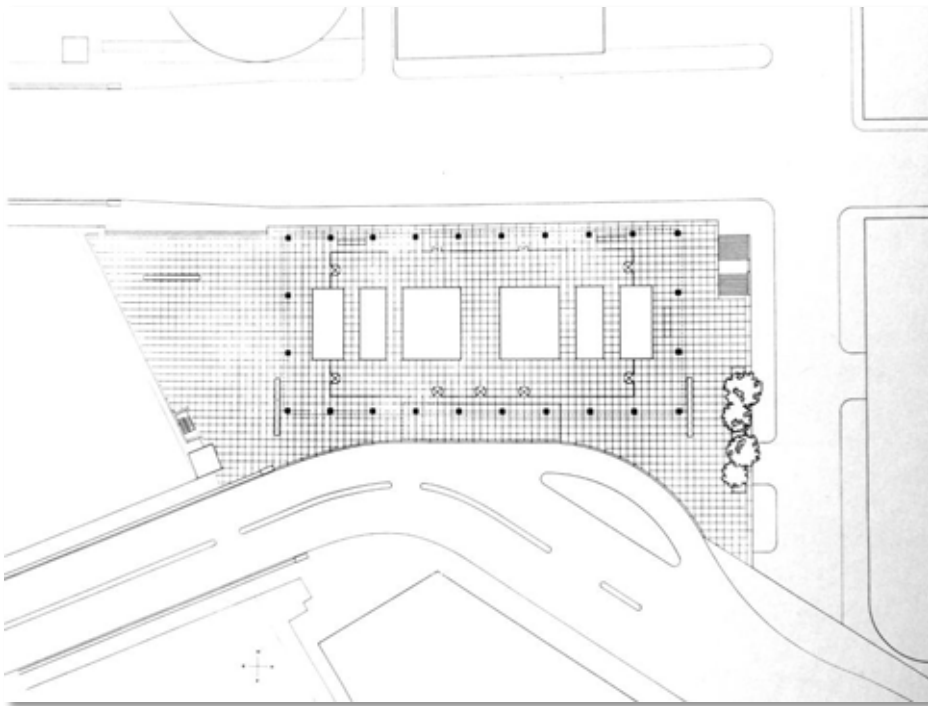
330 N. WABASH, GROUND FLOOR PLAN
